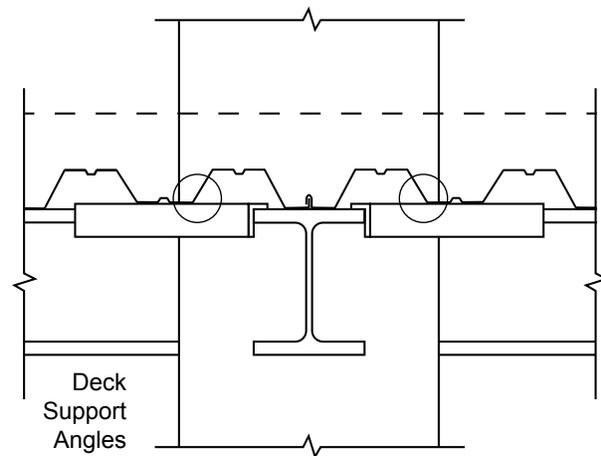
COLUMN DETAIL REQUIRING DECK SUPPORT ANGLES
